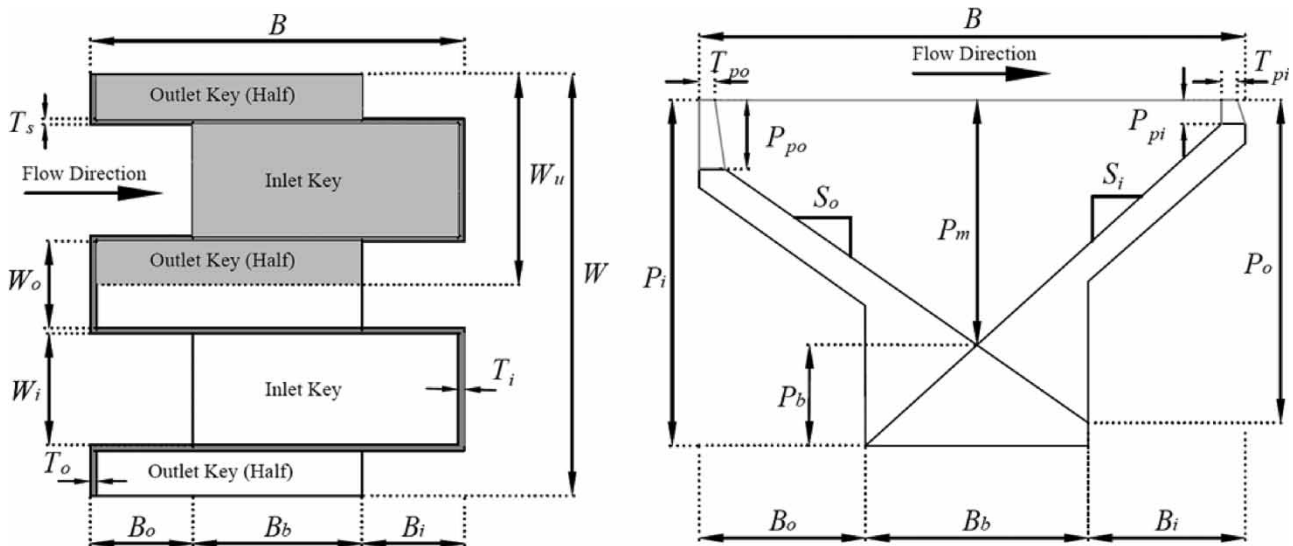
| Fundamental parameters of a PKW and unit PKW – plan view (left) and cross-section (right).
